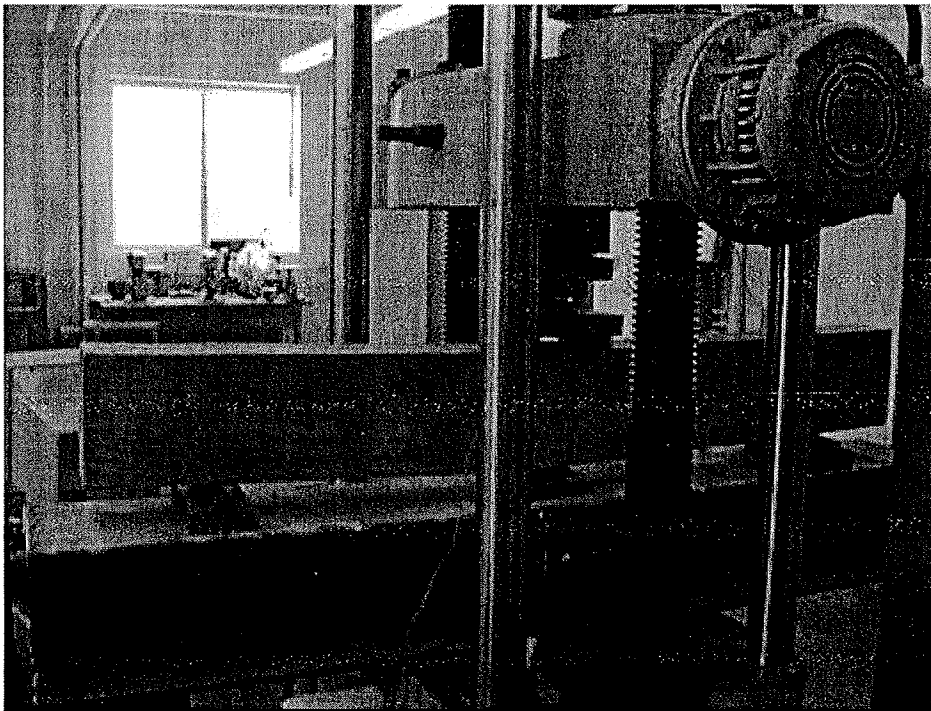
BRC -4 beam with two lab twisted cables. Each twisted cable was made by twisting three individual wires of 0.19 inch in diameter in the lab.
